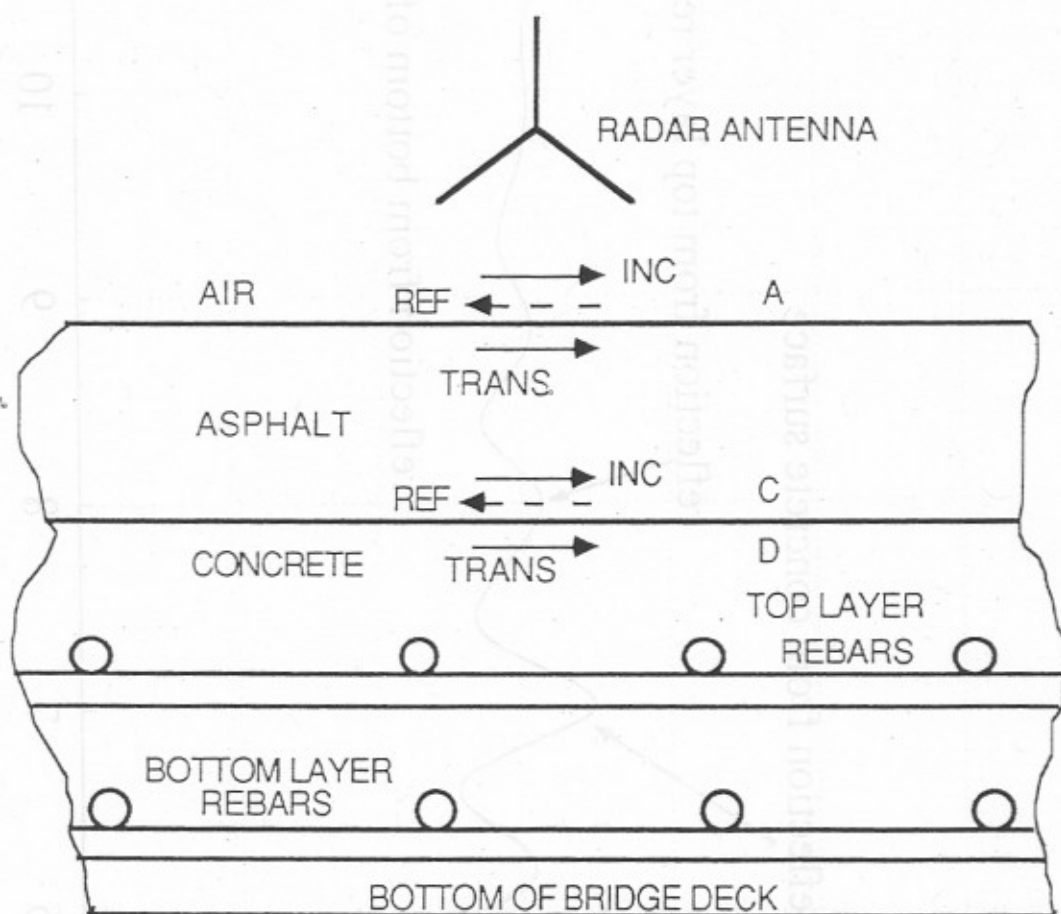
(a): Model of a typical asphalt-covered bridge deck structure.
